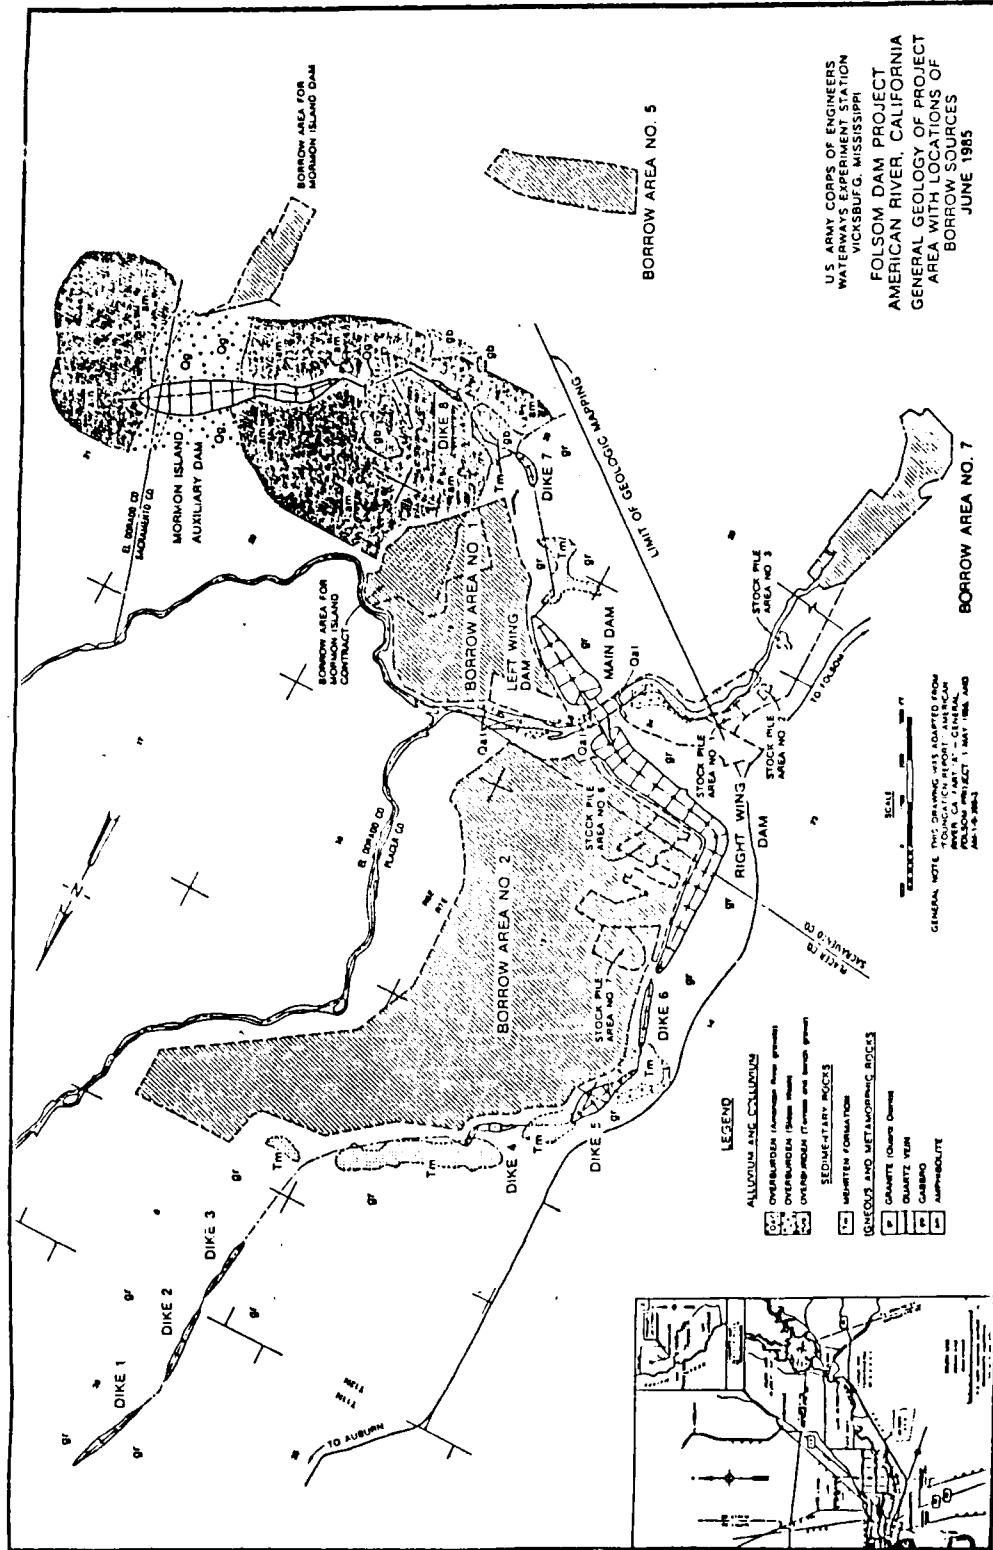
Plan of man-made retaining structures at Folsom Dam Project
